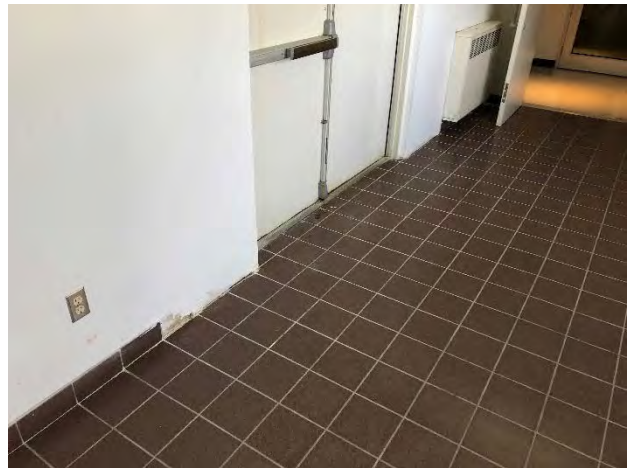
Viewing Water Damage to Corridor Link
